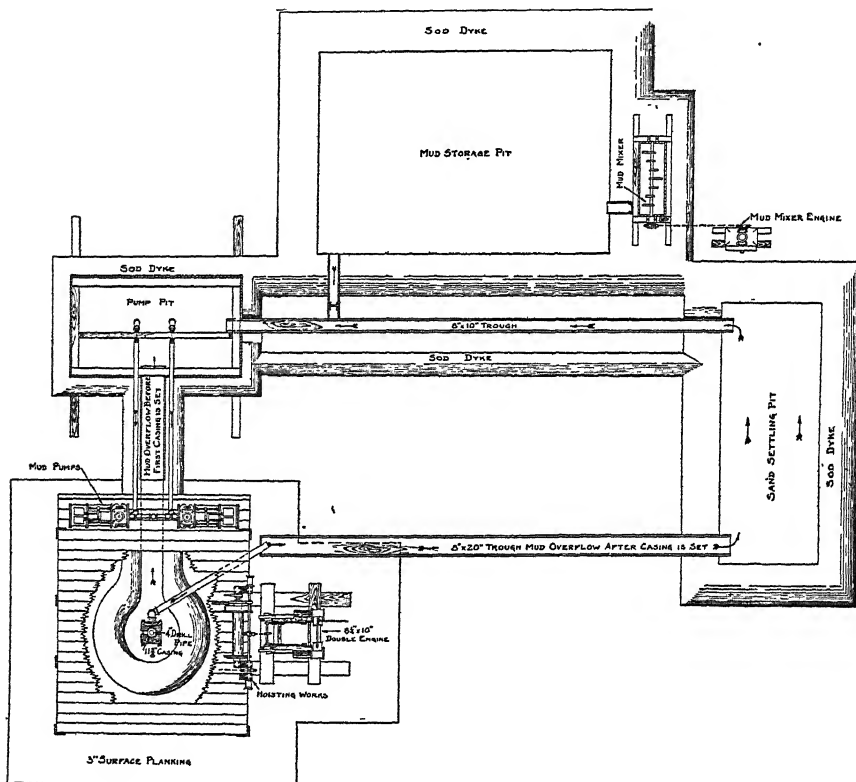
PLAN OF WELL-DRILLING PLANT SHOWING CIRCULATION OF MUD.
